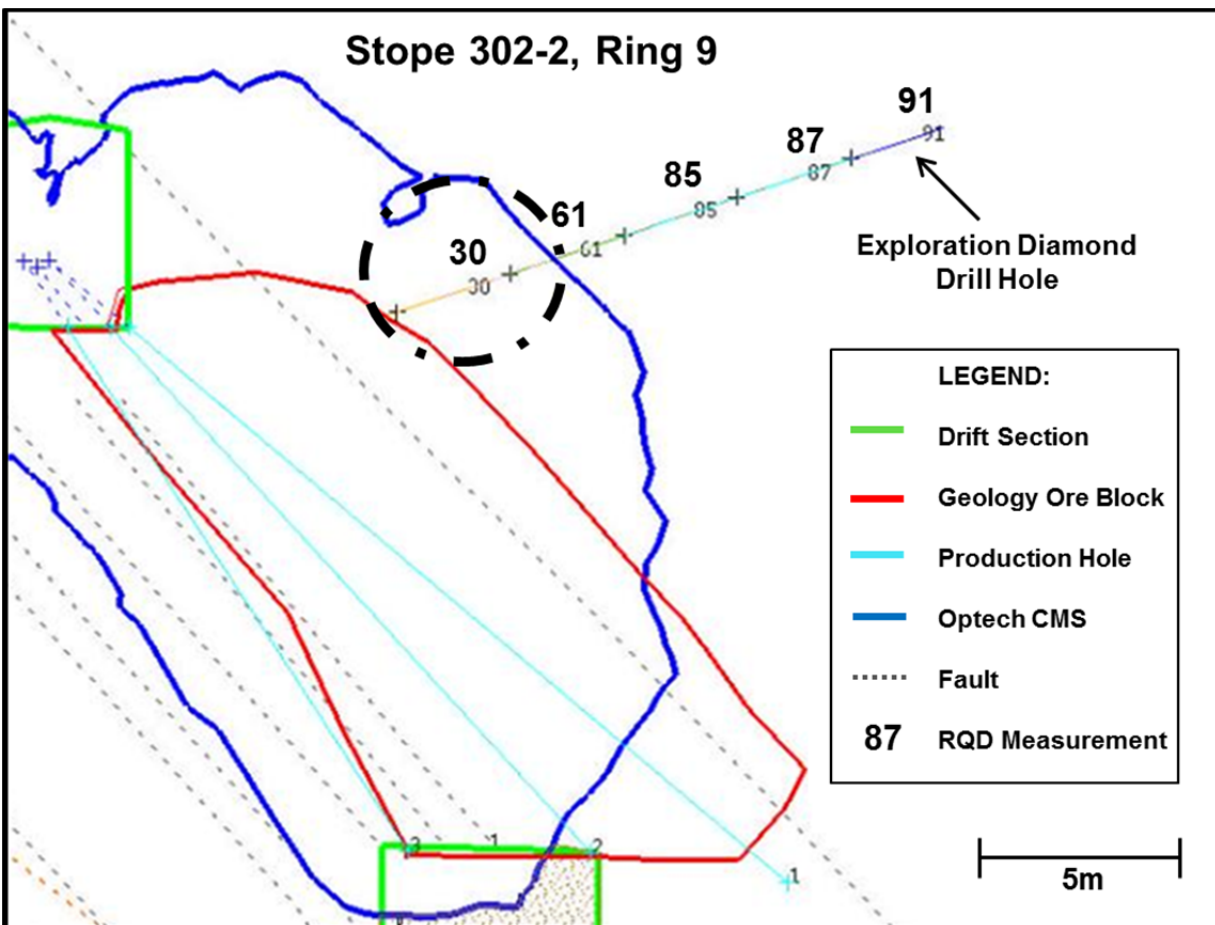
Section view of a stope with a diamond drill hole intersecting the stope from the hanging wall side. Exploration diamond drill hole RQD values are shown. (From Forster, 2011)
